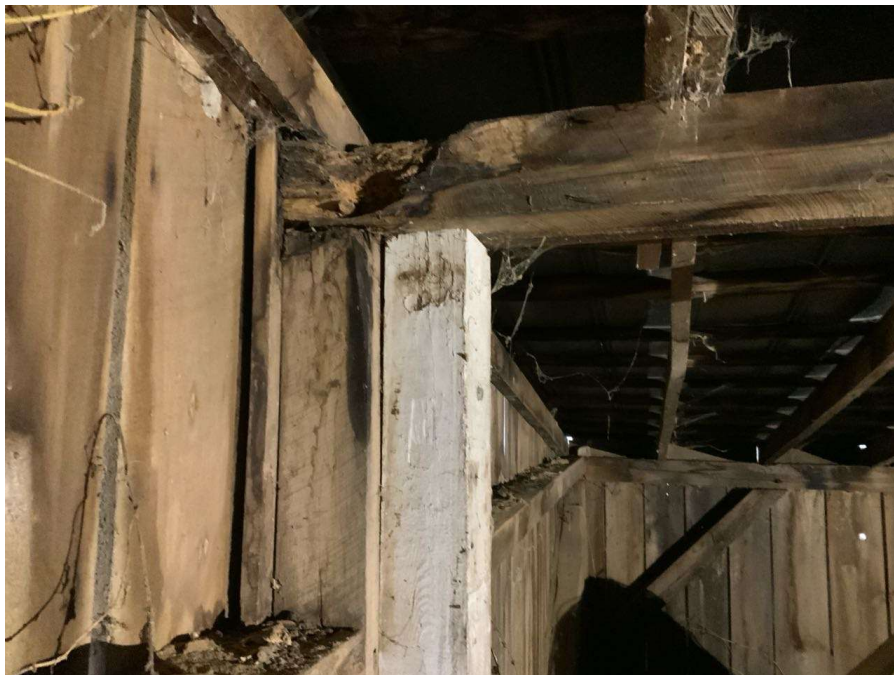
Beam between Column M/6 and N/6 exhibits rot with full pick penetration at east bearing. A 5.25" x 5.25" post has been added to the west side of the column to help support the beam.
